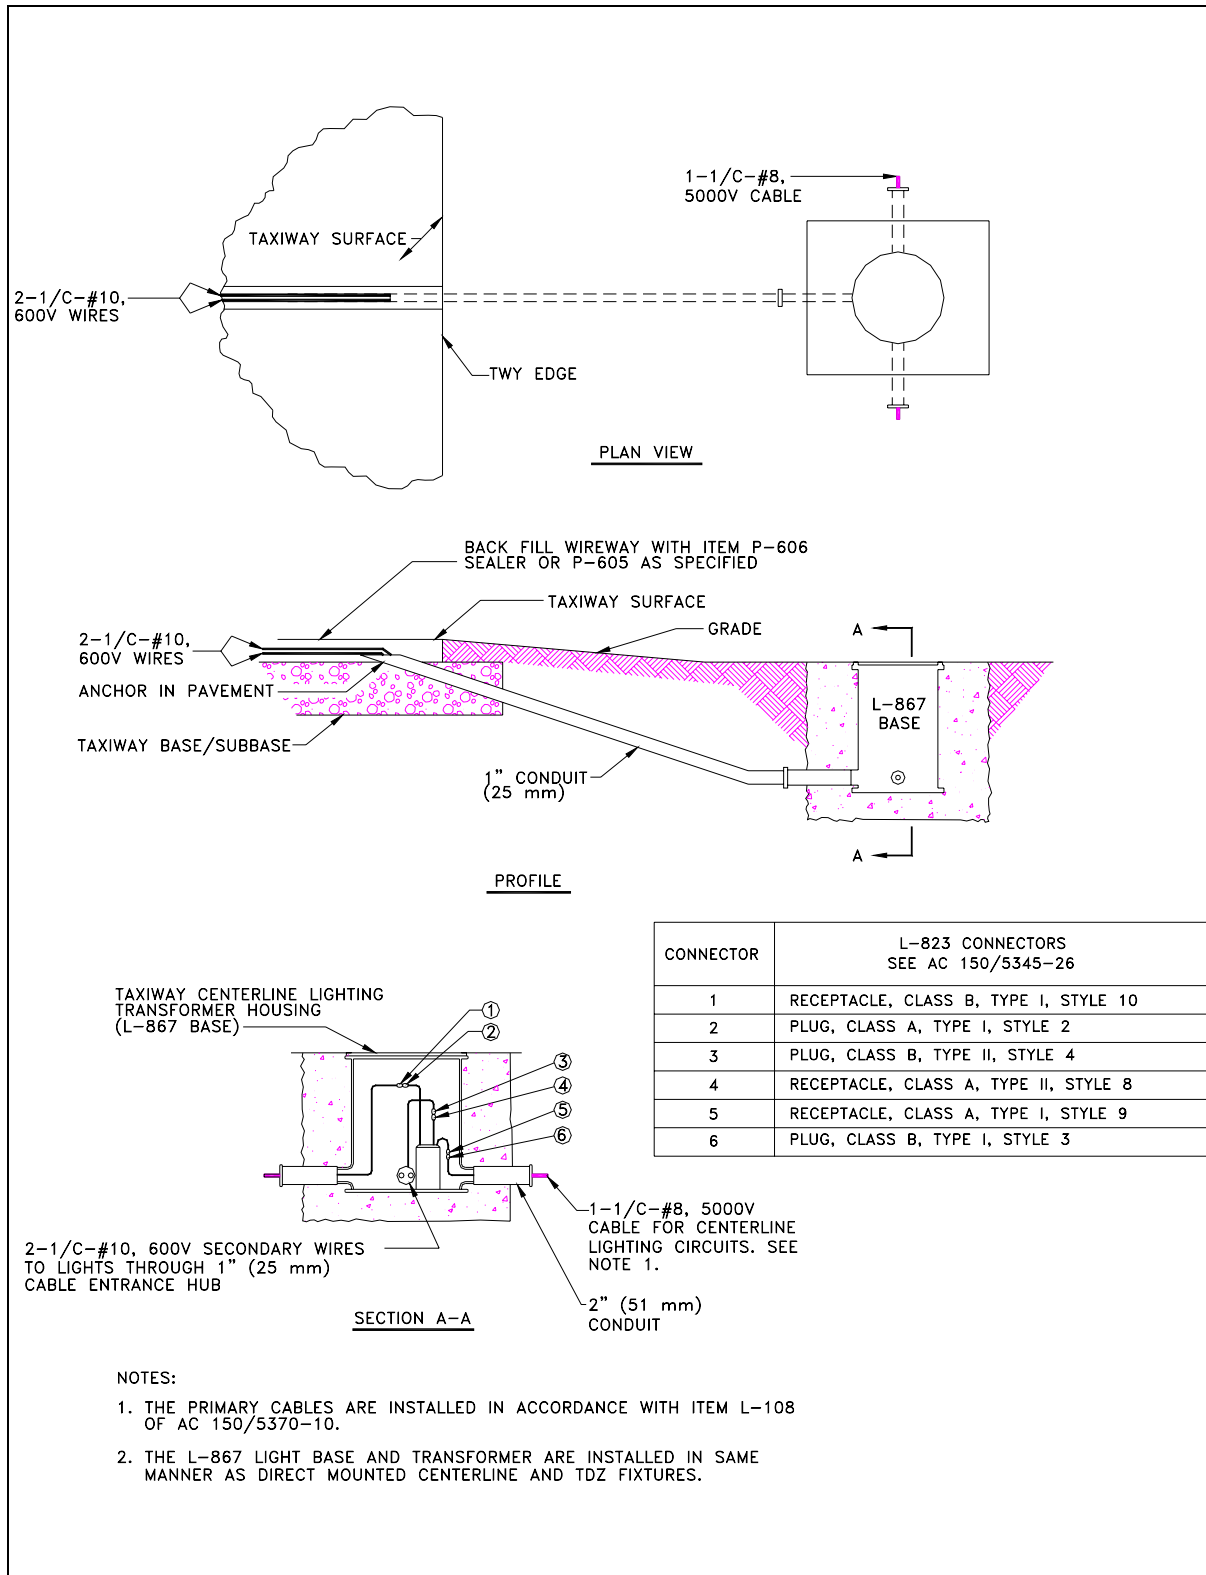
Typical Transformer Housing and Conduit Installation Details for Taxiway Centerline Lights.
